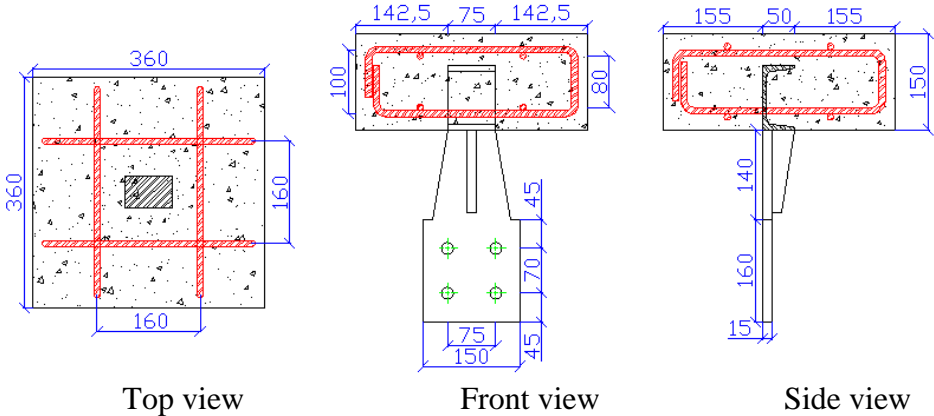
Details of pull-out test specimen (All dimensions in mm).
